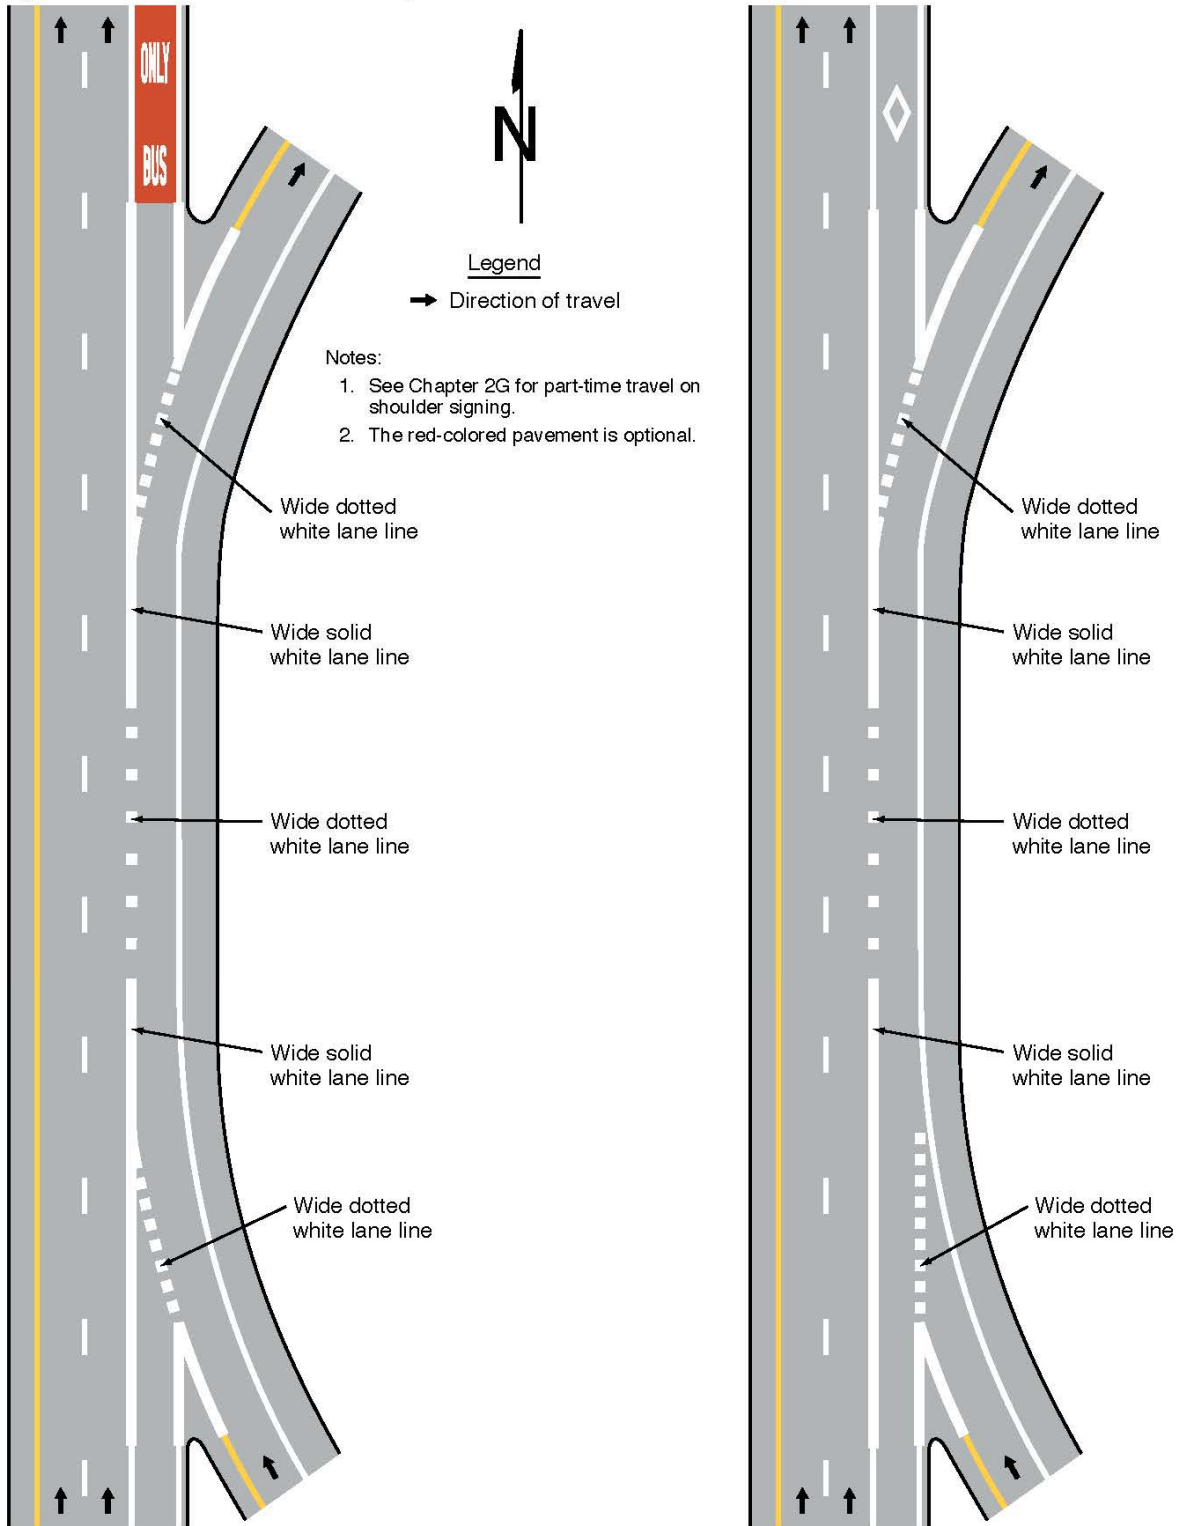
E-5. Markings for Part-Time Travel on Shoulder and Application of Pavement Word Markings (Sheet 3 of 3)
